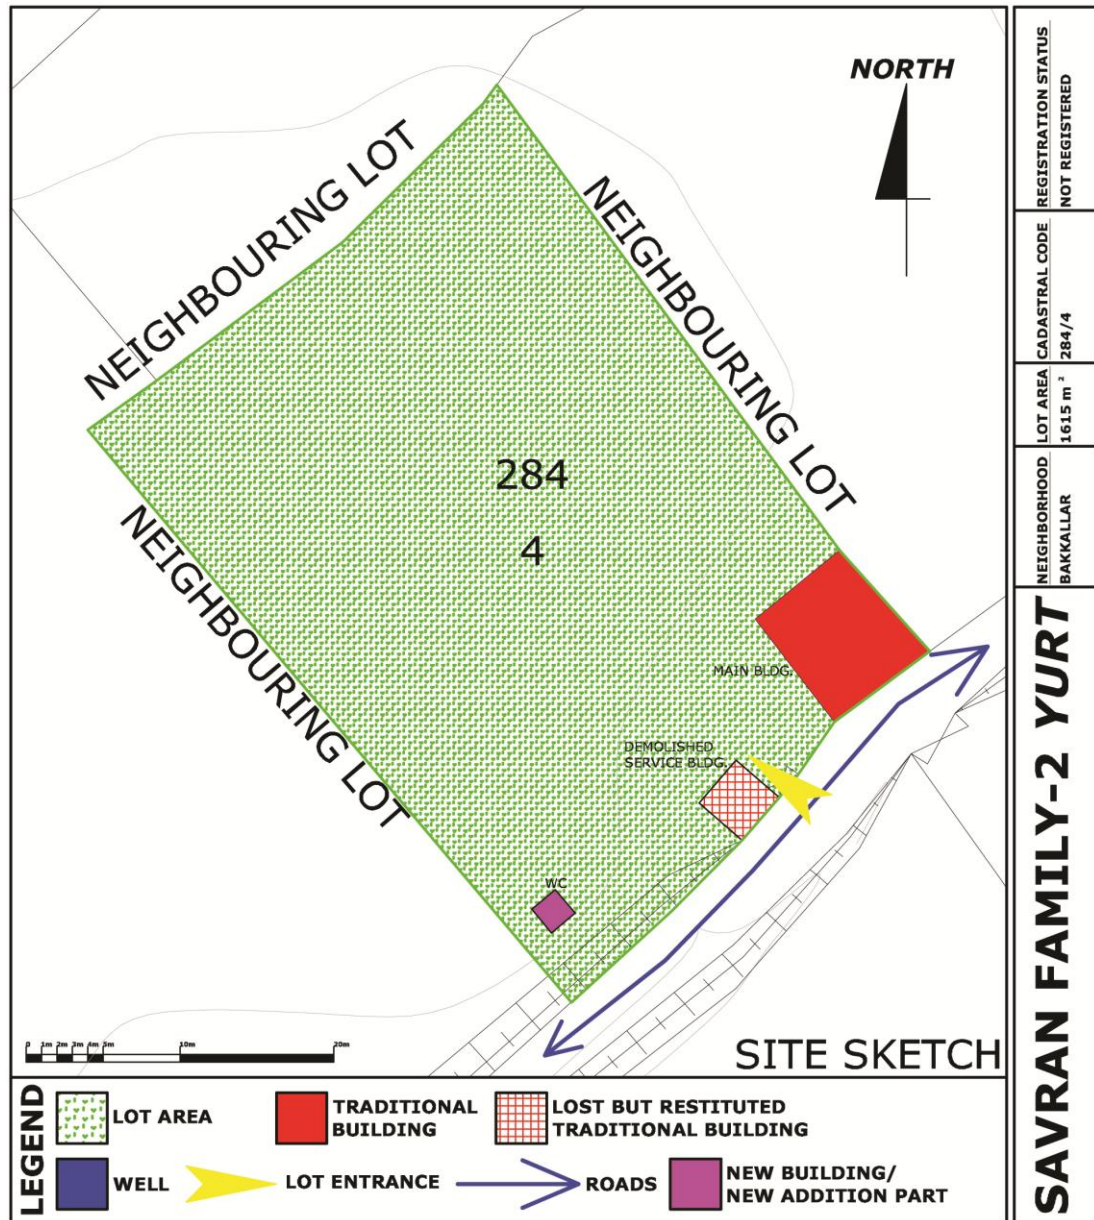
Site plan sketch of *the yurt* of Savran Family-2
